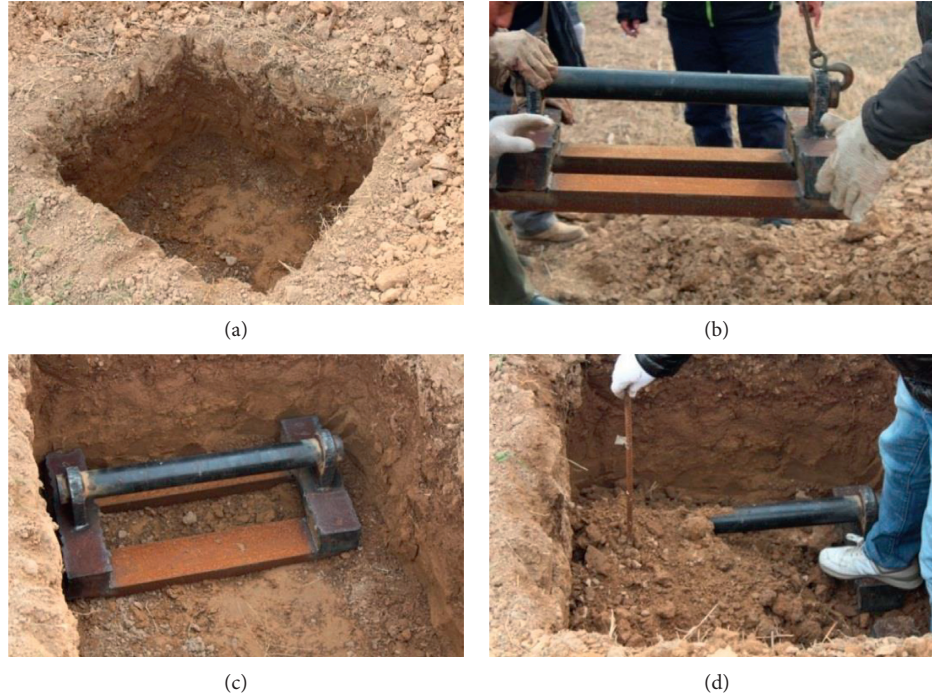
Test site during preparation. (a) Test hole excavation. (b) Specimen hoisting. (c) Specimen arrangement. (d) Buried depth calibration.
